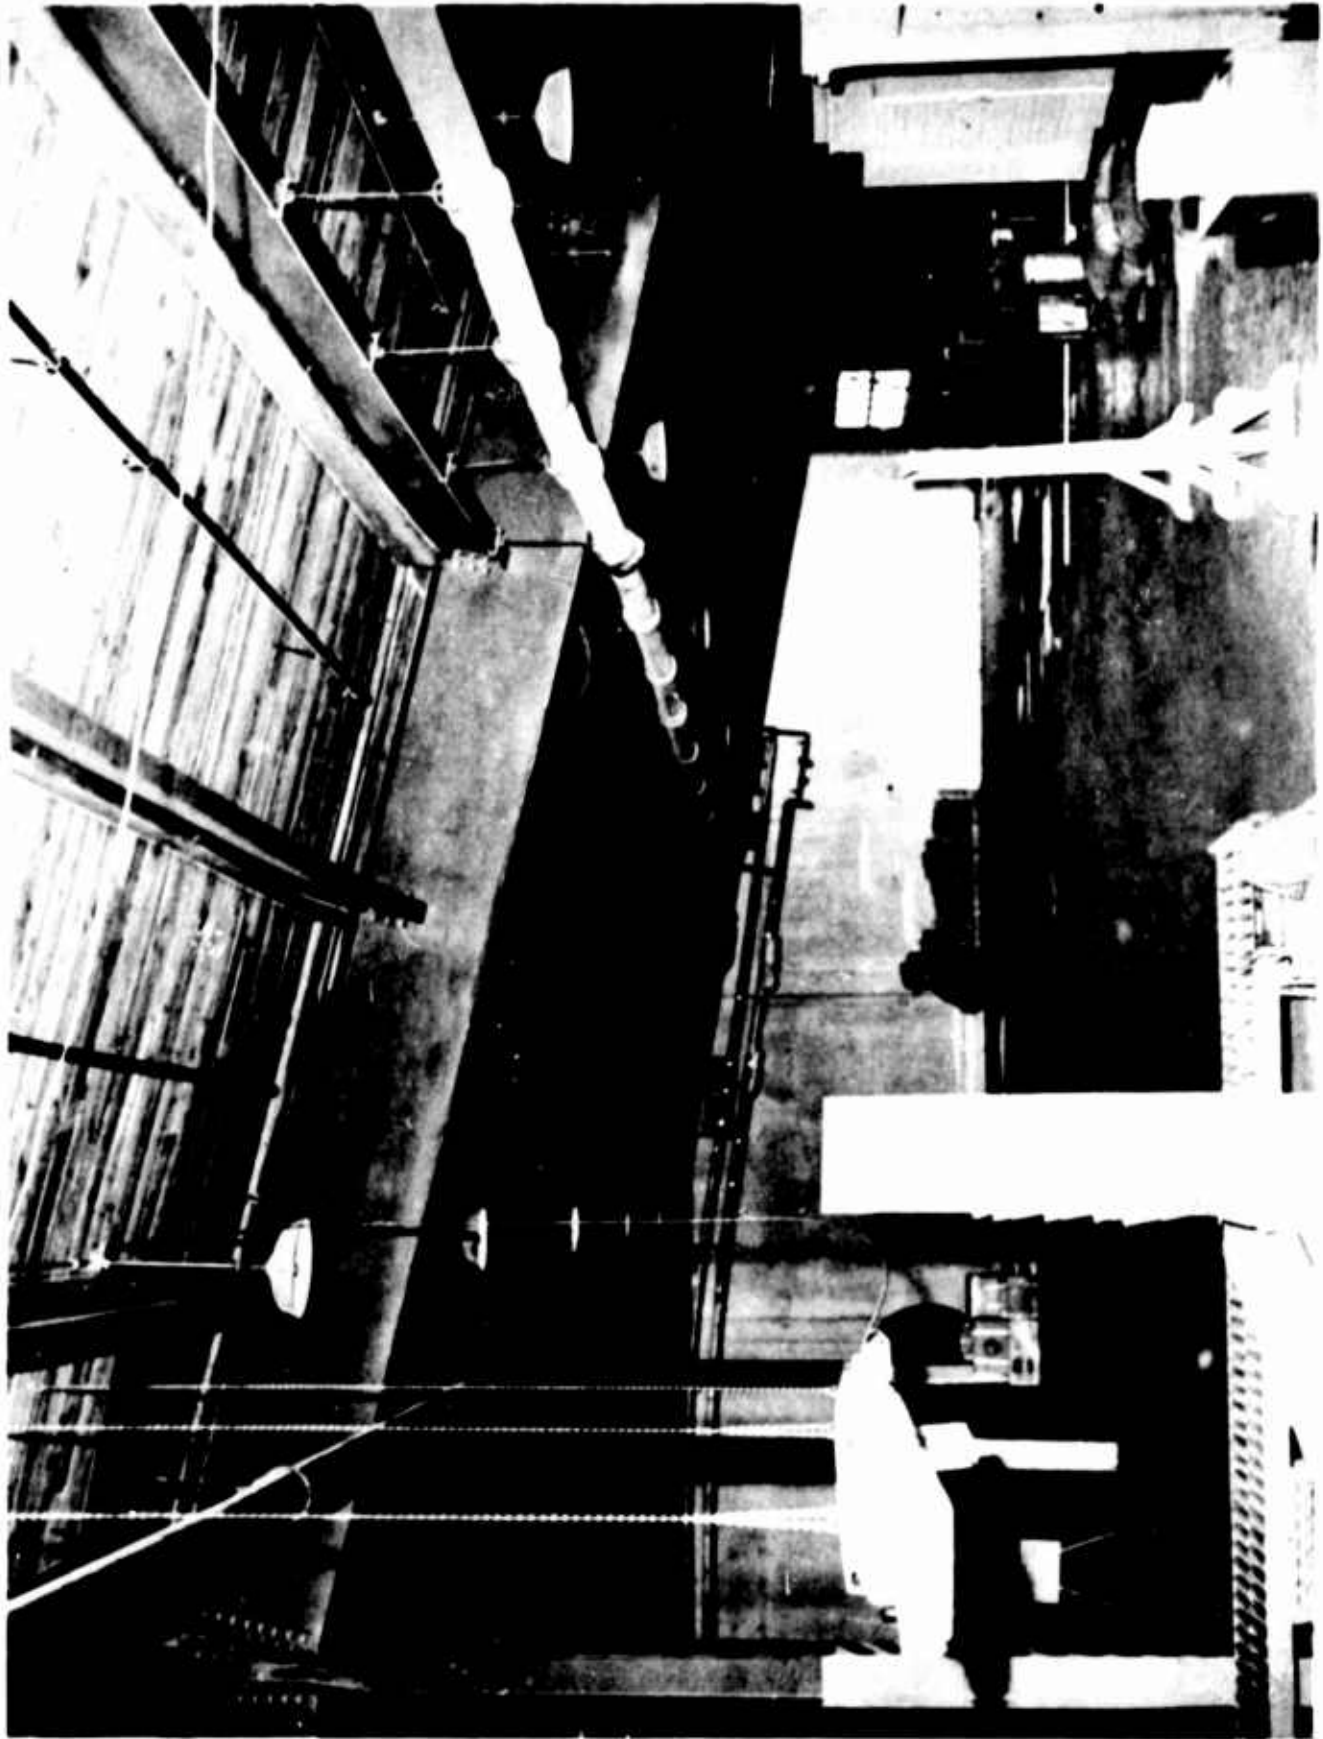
Elmendorf AFB Warehouse (Interior view showing lack of crossbracing)
